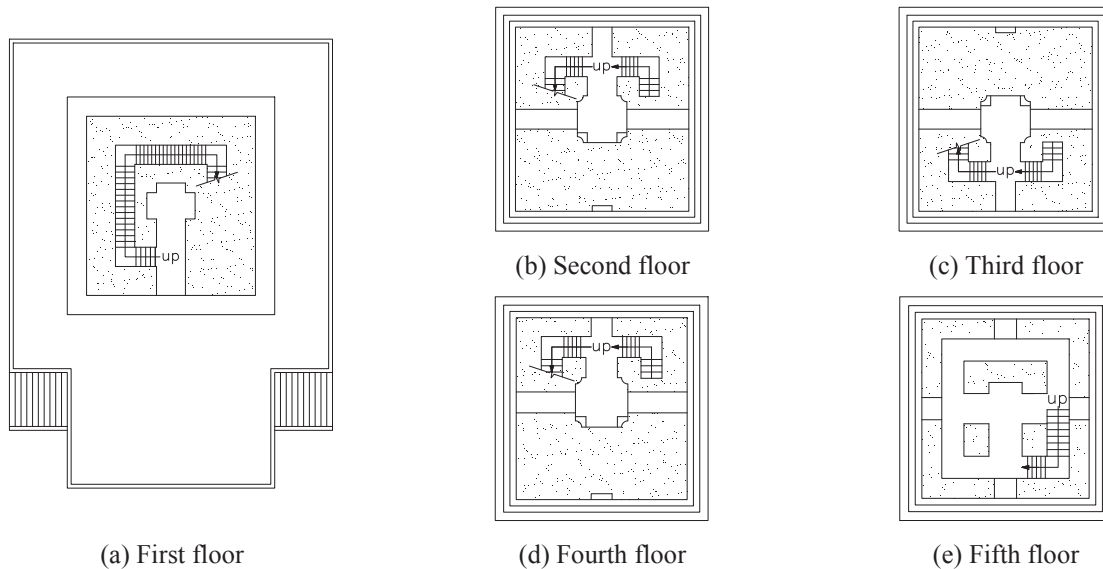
Plans of each floor in Longhu pagoda (Source: Adapted from document available in [8])
